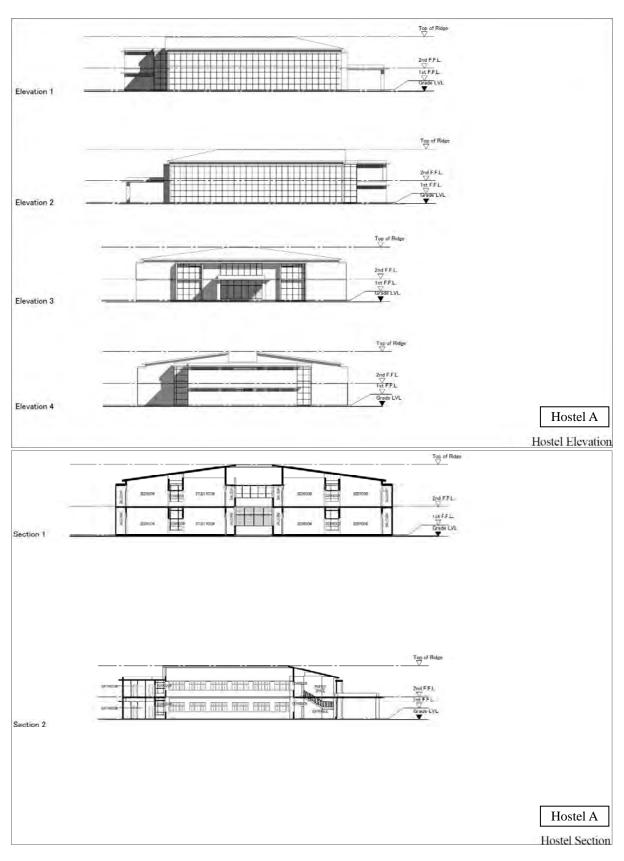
Plan of Hostel A (Elevation & Section)
